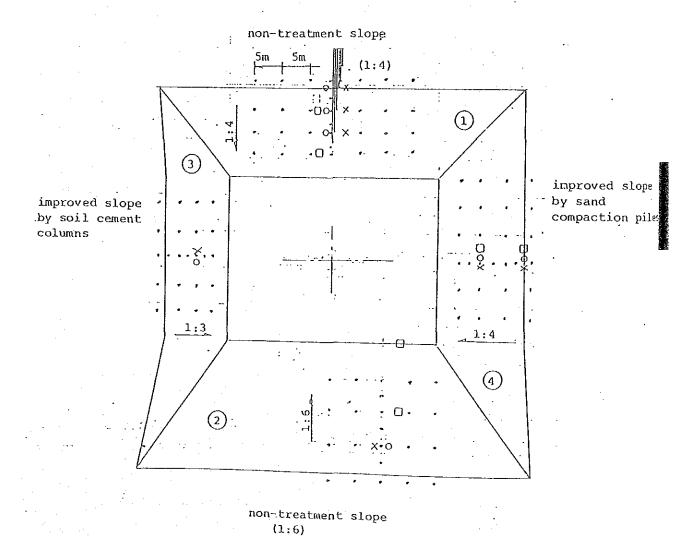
Arrangement Plan of Monitoring Instruments
